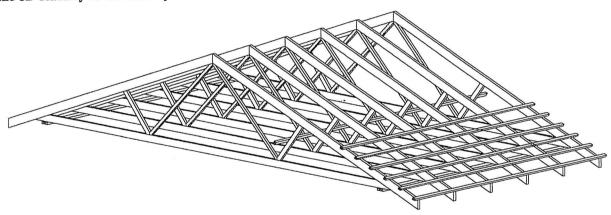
Battens used for bracing and load-bearing material for the roof on W-trusses.
